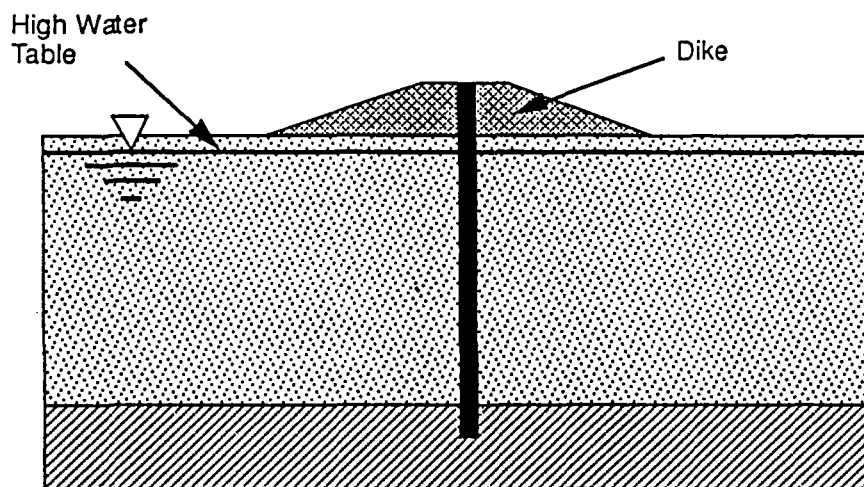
Construction of Dike to Raise Ground Surface for Construction of Slurry Trench.
